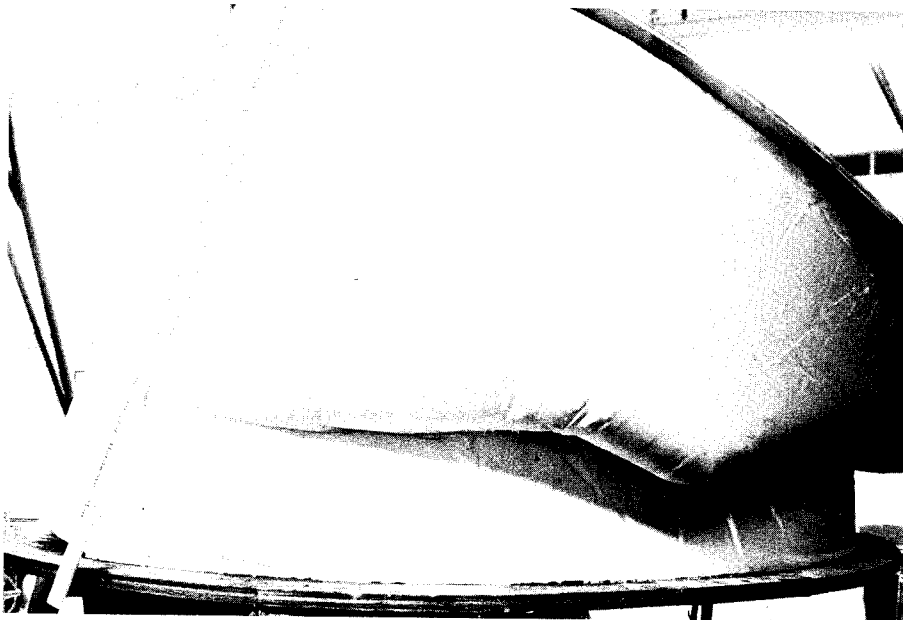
Large Cylinder with Buckling Failure on Initial Test
